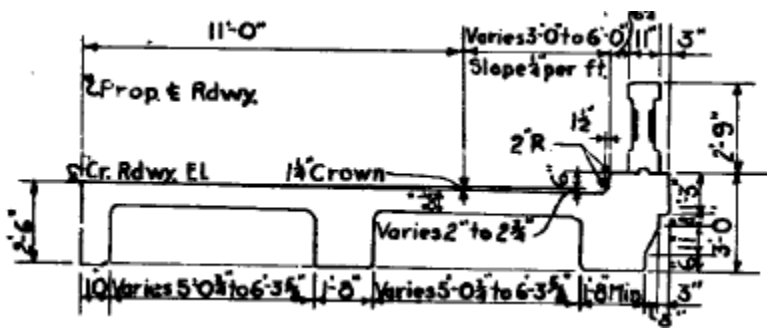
Typical Section of Spans 1 and 3 of the Bridge (NBI 32200) (1940)
